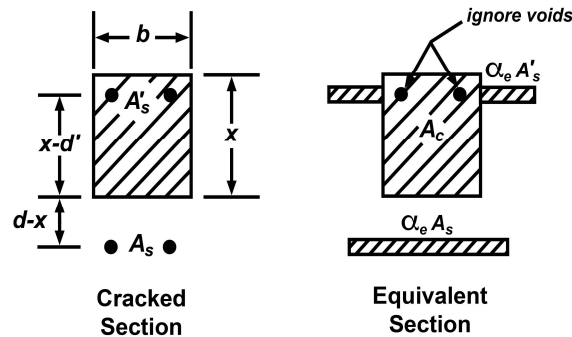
Equivalent section of cracked reinforced concrete section [8]
